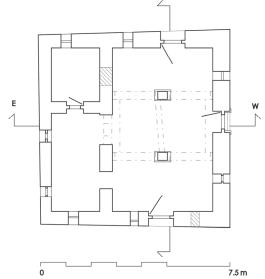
Church of Lədätä Maryam, Wällo, floor plan; drawing by Zara Thiessen
